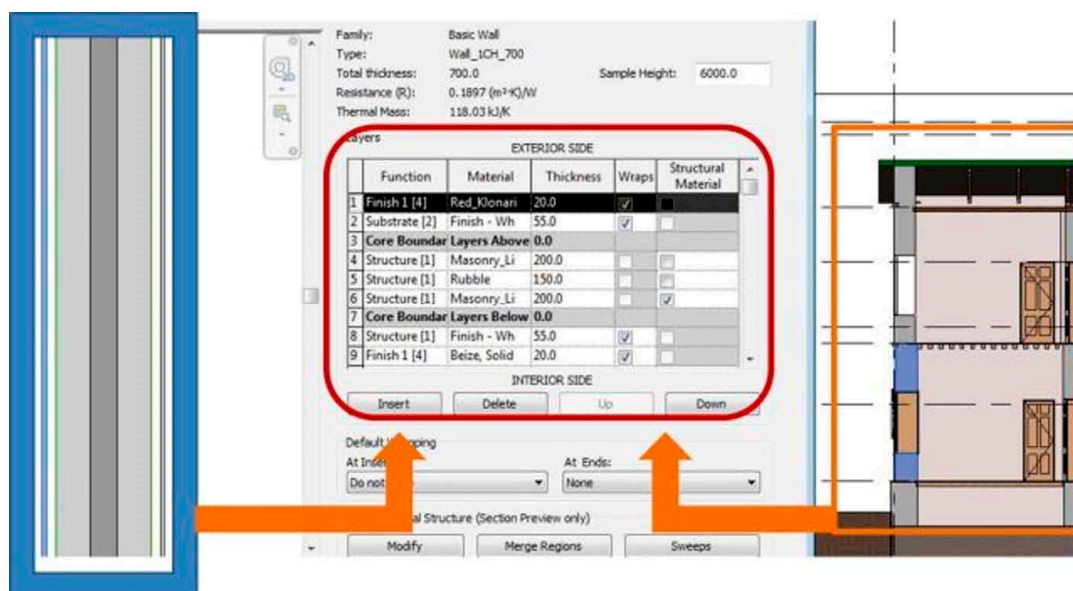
Wall structural element of the 1st construction phase incorporating stratigraphic information.
